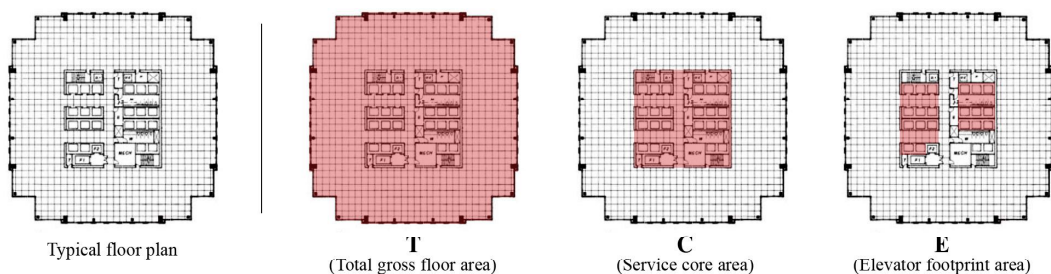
Demonstration of “T, C and E” on typical floor plan of One Liberty Place
